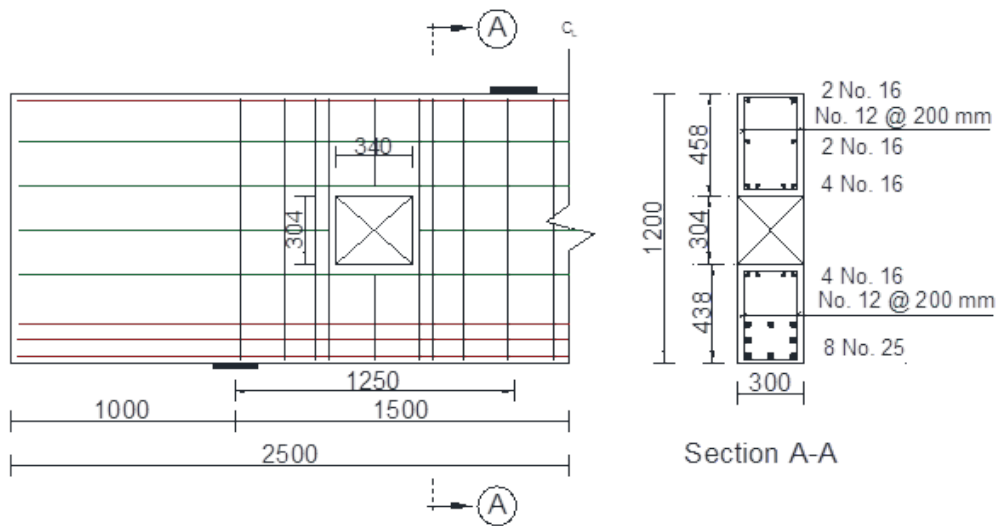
Details of DB-O2 (Dimensions are in mm)
